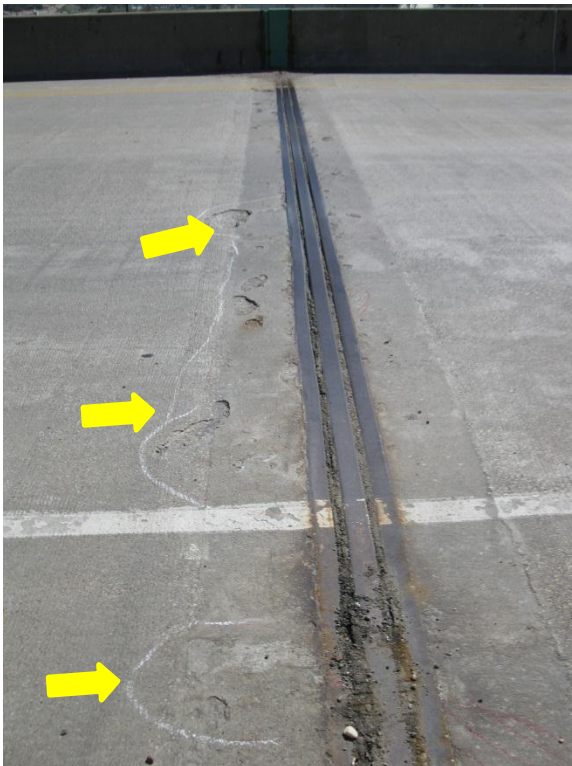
Typical delamination of concrete deck surface (highlighted in chalk) near a modular expansion joint seal system.
